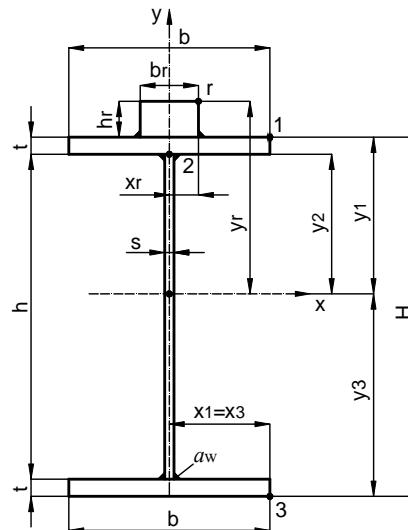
The cross-sectional area of the welded I-girder
